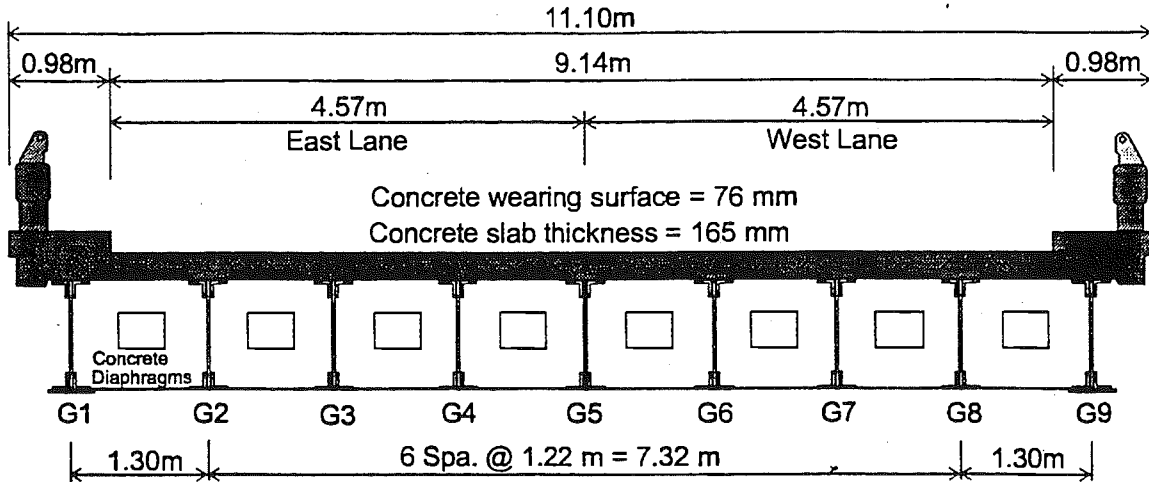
Cross-Section of the Bridge M19/MC (B04-77012).
